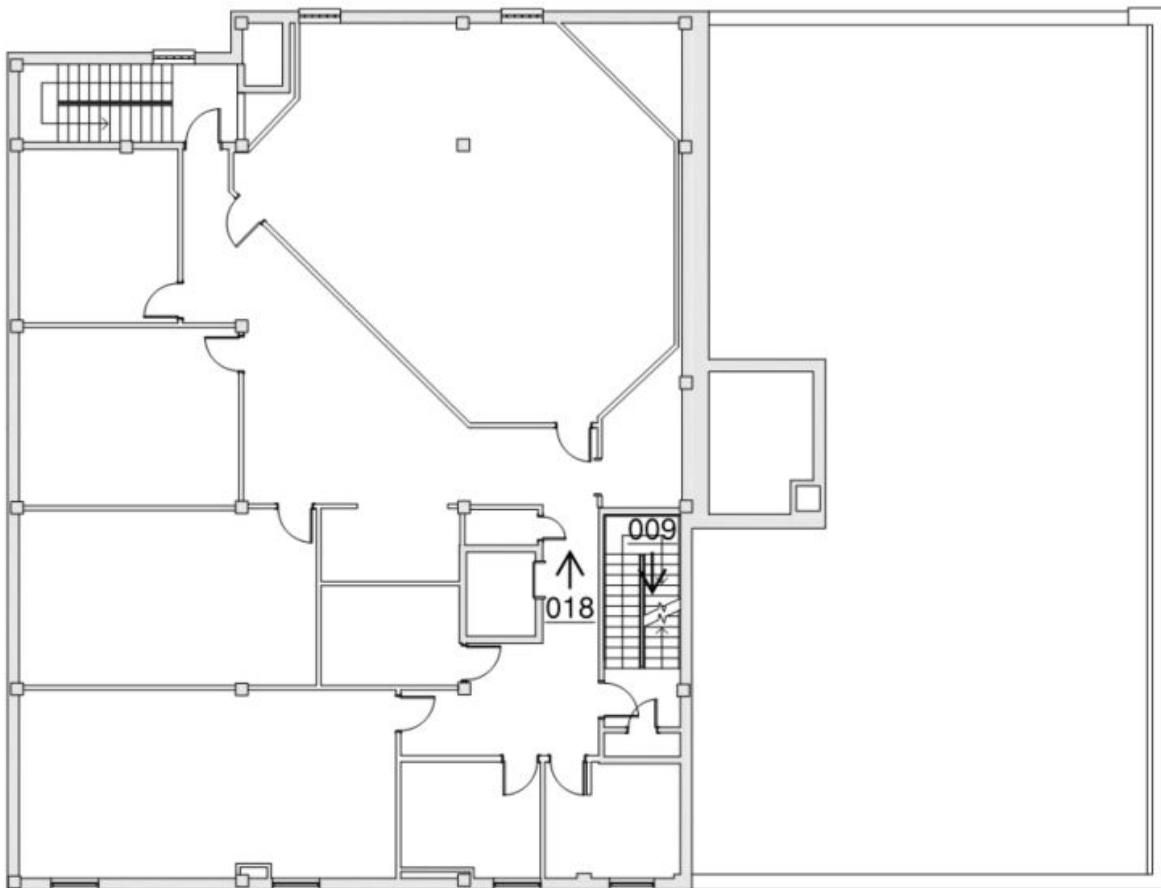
Third Floor Photographic Key Plan. Alley Poyner Macchietto Architecture, Omaha, Nebraska, 2021
